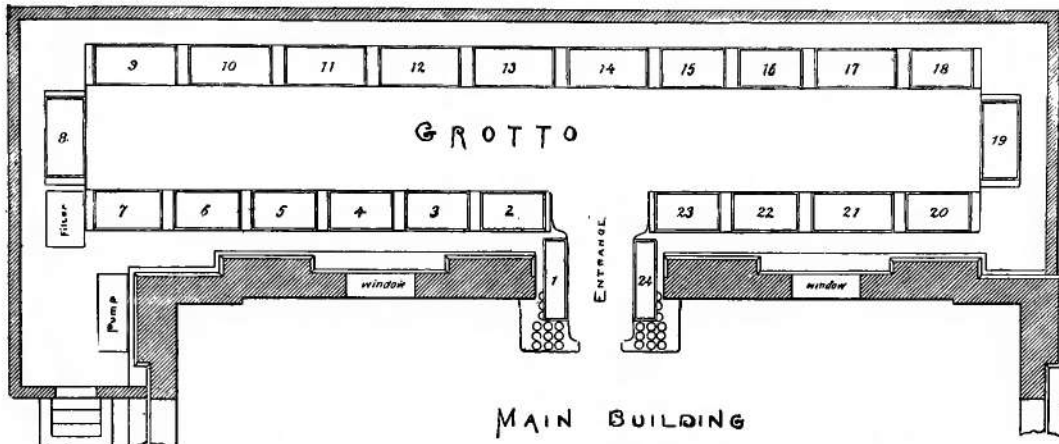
Plan of Grotto at the Central Station of the Fish Commission, at Washington, D. C.
